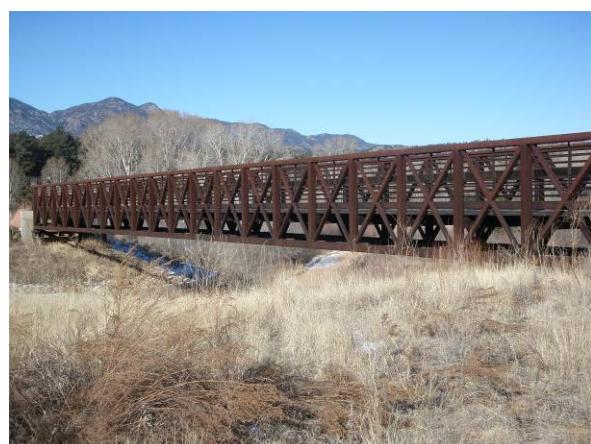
View of the footbridge under which conduit would be attached to house the fiber optic line across the bridge.
